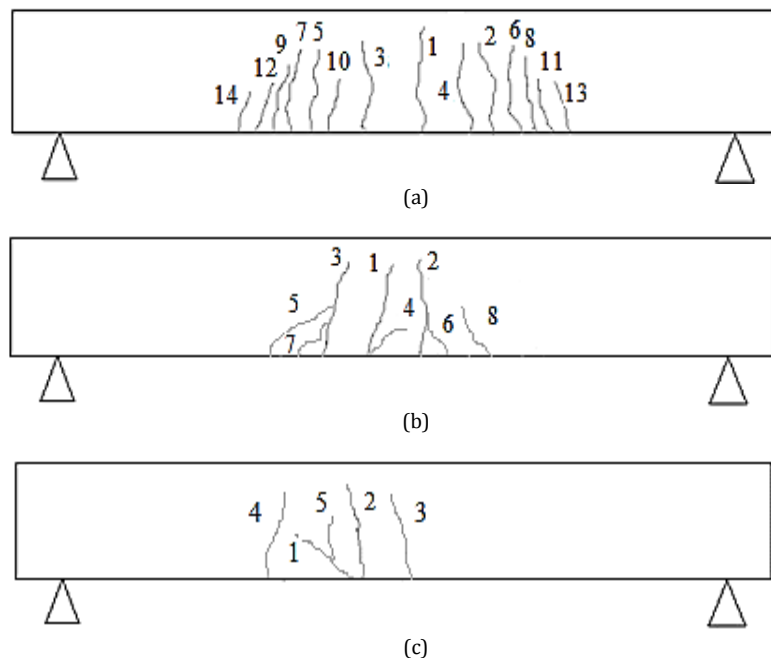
Crack propagation: a) Control beam specimen, b) Beam specimen strengthened with non-prestressed CFRP laminates, c) Beam specimen strengthened with prestressed CFRP laminates
